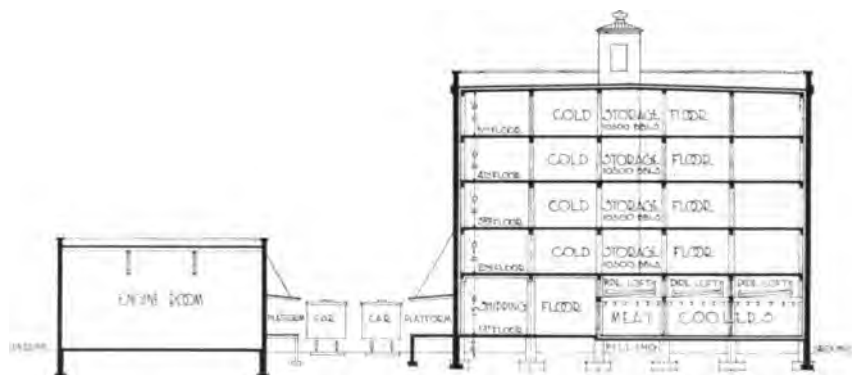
TRANSVERSE SECTION—COLD STORAGE AND ICE MAKING PLANT.
